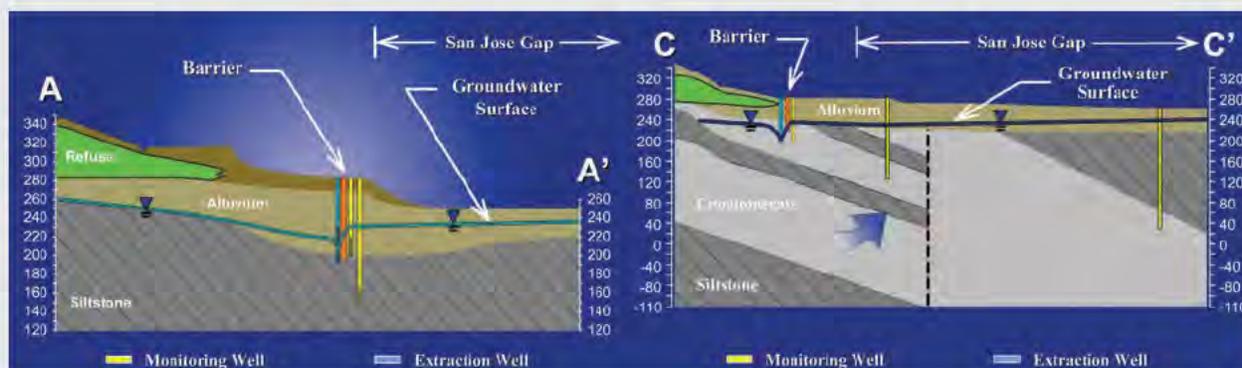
Cross sections through the vertical barrier systems at Canyons 3 and 1 at the Puente Hills landfill facility. SOURCE: County Sanitation Districts of Los Angeles County.
